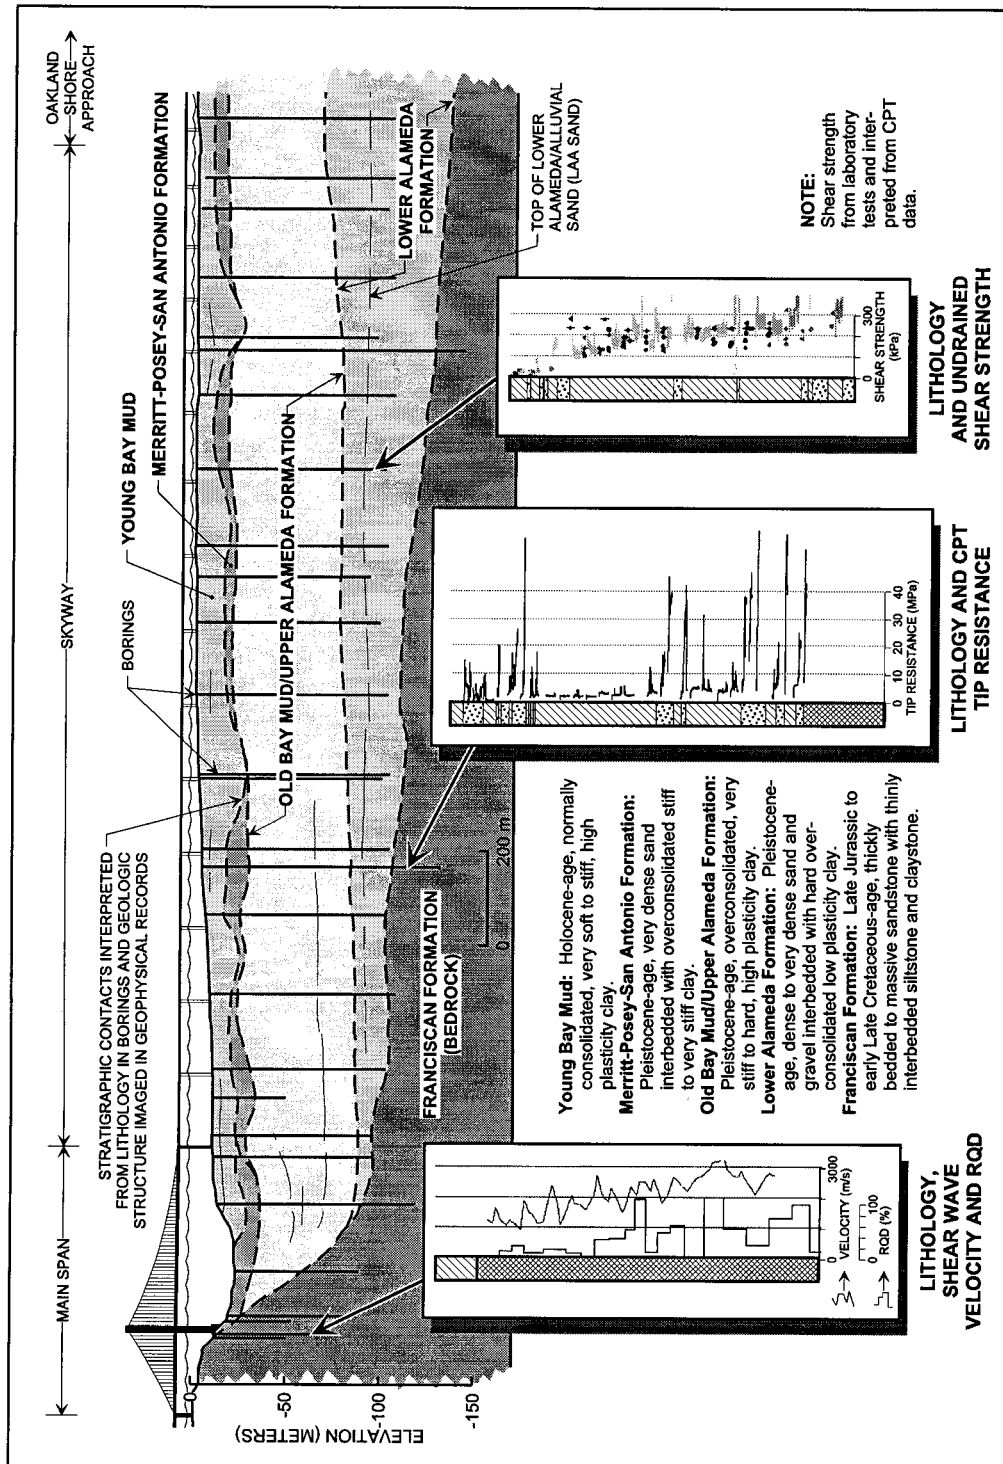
Interpreted Stratigraphic Section Along New Bridge Route
